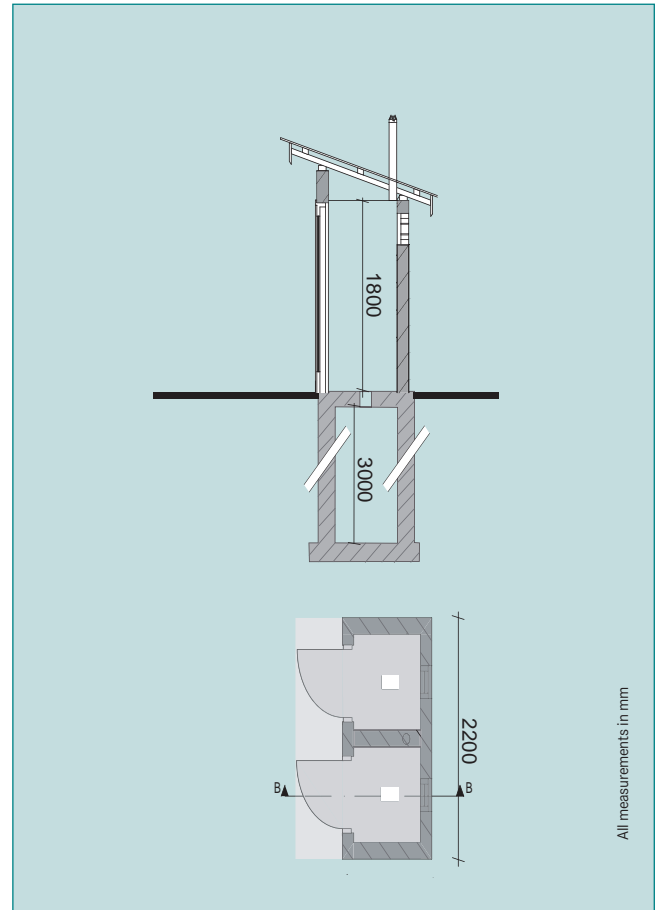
Section and floor plan of ground-level U-ACT VIP latrine
